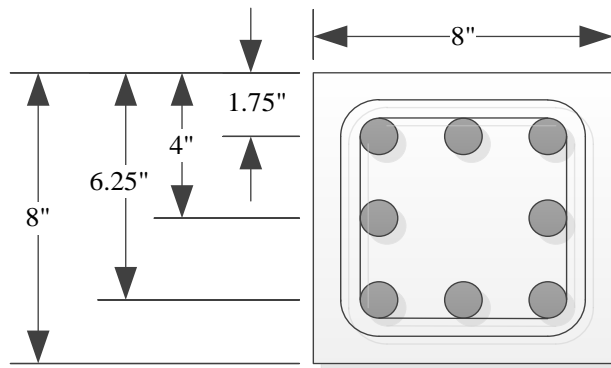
4 Cross section of BFRP Beam (UHP-FRC #3 and #4)
